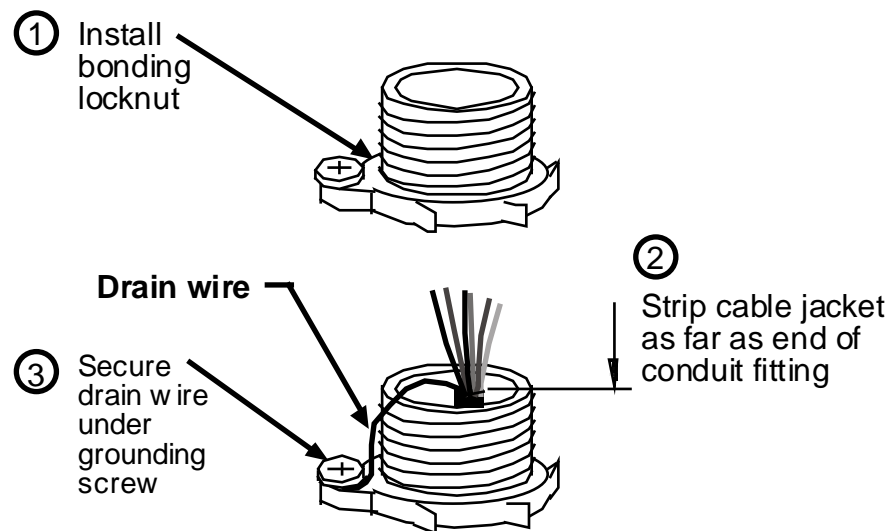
Terminating a Cable Shield with a Bonding Locknut
